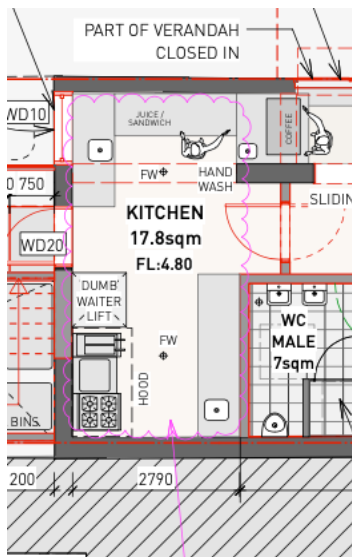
, Ground Floor Kitchen: Dumb waiter relocated, kitchen equipment layout changed
